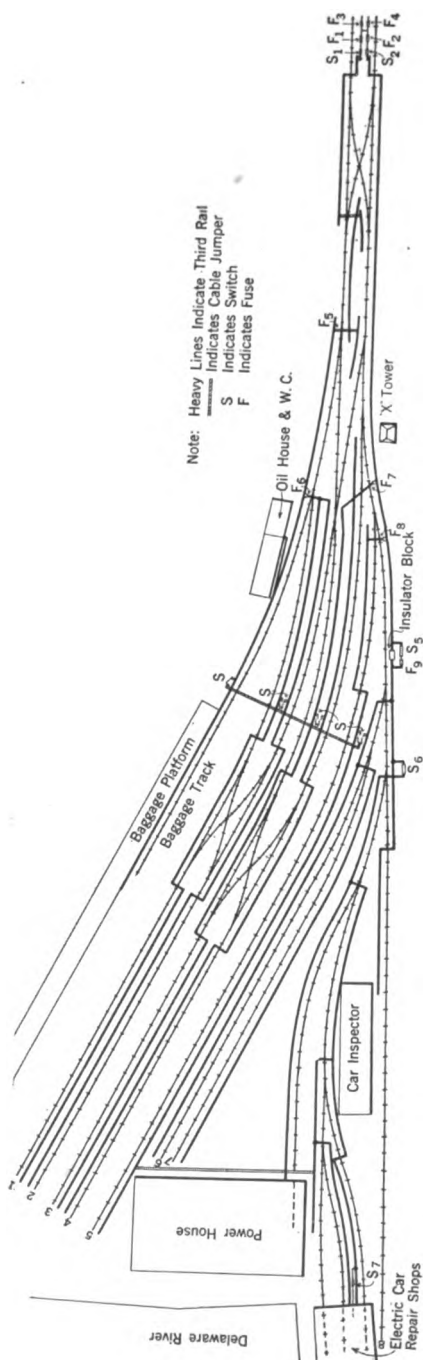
THIRD RAIL SECTIONALIZING SWITCHES IN CAMDEN YARD
